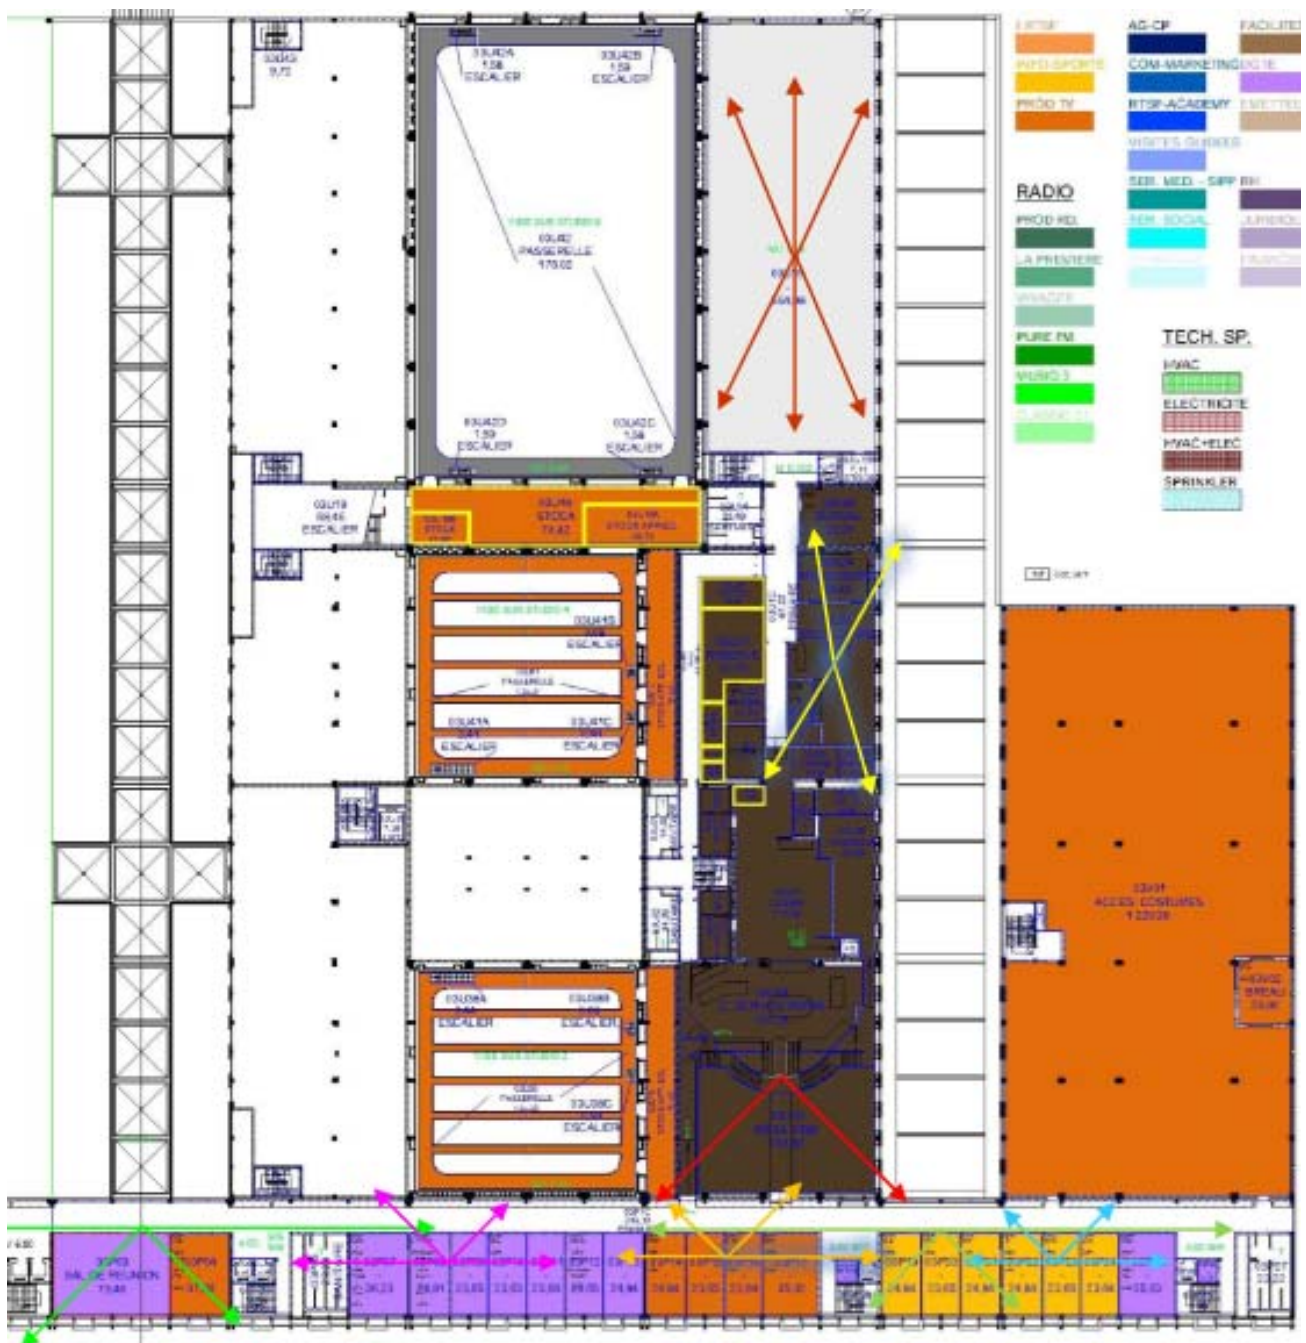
Design at 2.4 GHz for Floor 3 in Building CHJM
